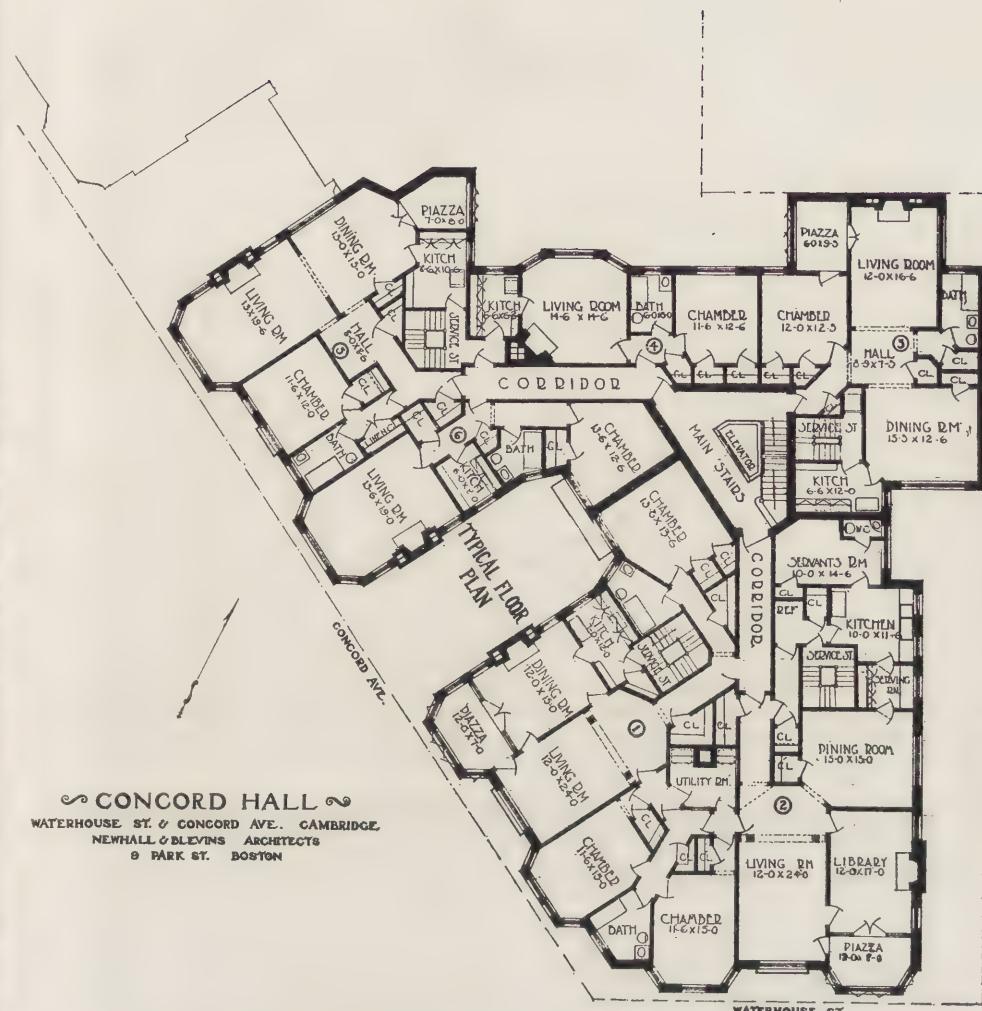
TYPICAL FLOOR PLAN—CONCORD HALL, CAMBRIDGE, MASS.
